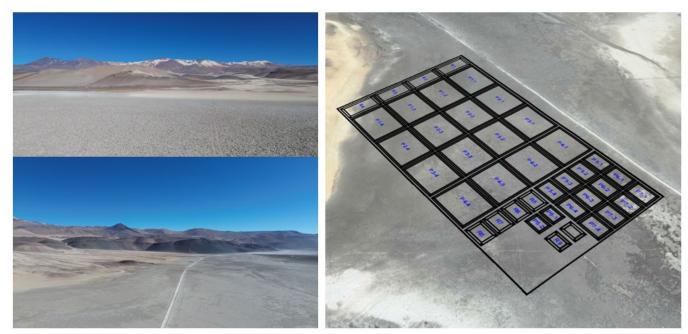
Proposed Pond Location and Layout at Rio Grande Sur
